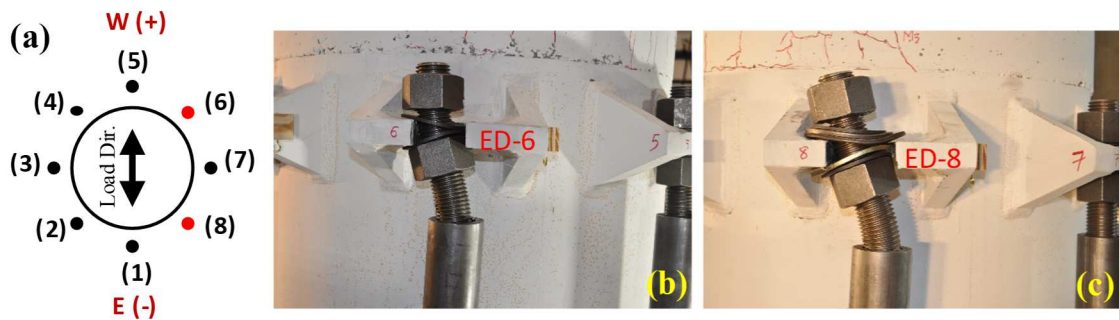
Damage in top connection of ED links in PUED rocking column at $1.8 \times DE$: (a) location of damaged links (red circles); (b) damage in ED-6; (c) damage in ED-8.
